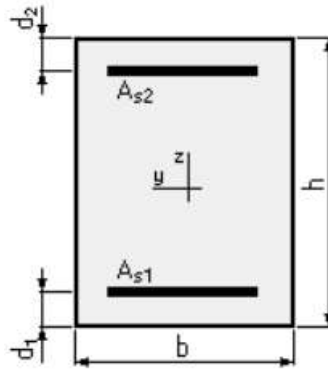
Beam cross-section layout and reinforcement nomenclature (BEAM DESIGN: PS 30×50).
